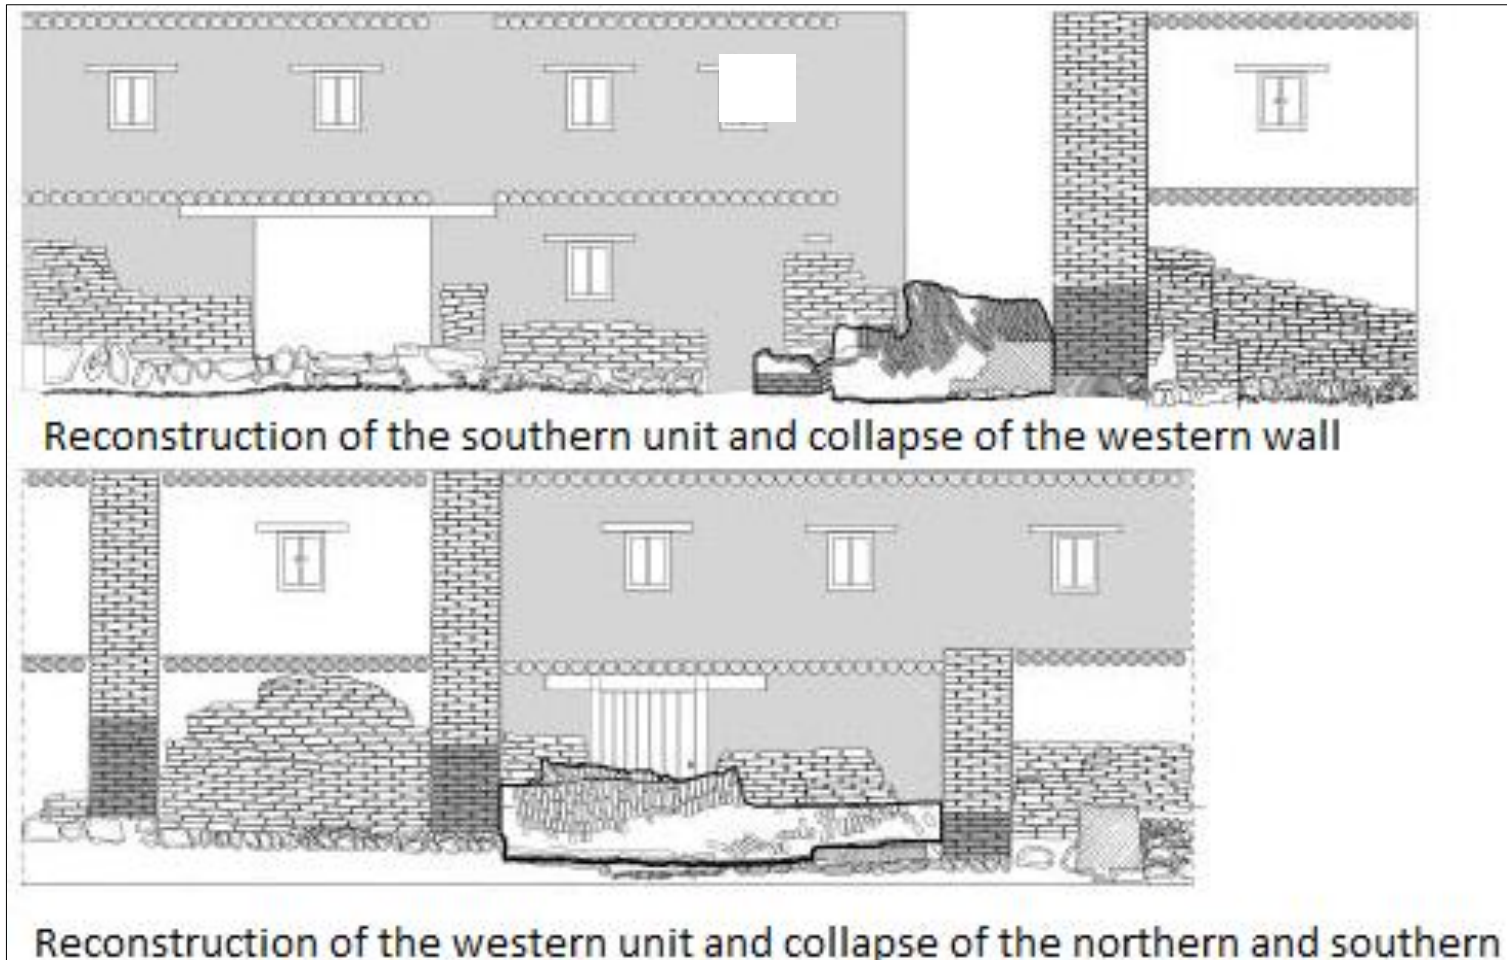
The reconstruction of the Collapse of the Building at Salat Tepe (Ökse *et al.*, 2010:478)
